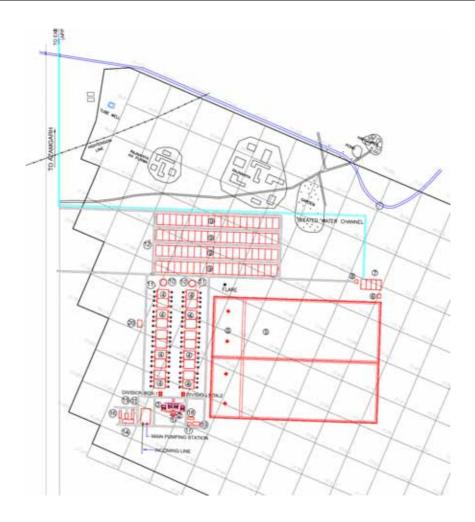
Recommended Layout of Sathwa Sewage Treatment Plant
